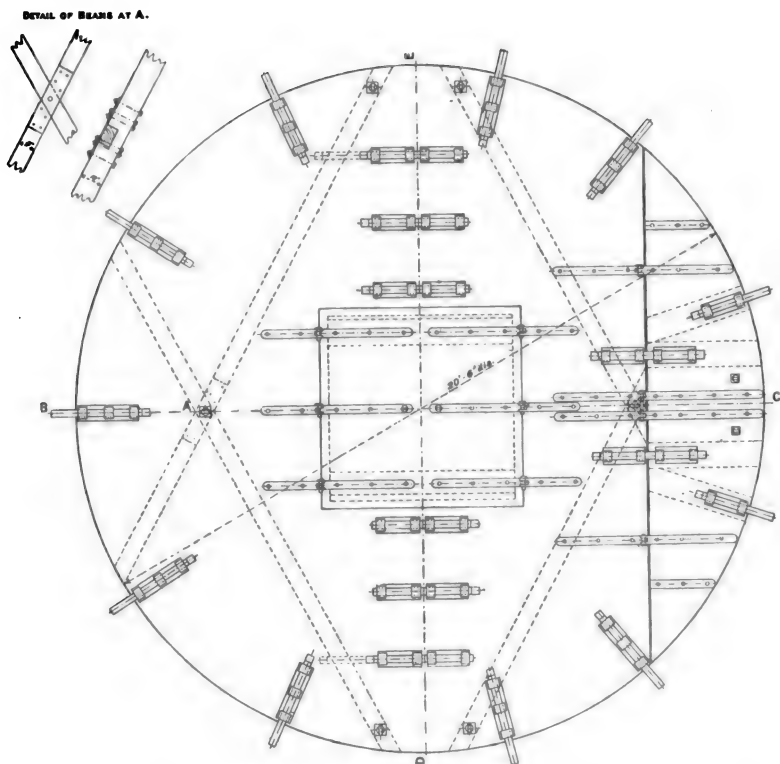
Plan of Walling Stage or Cradle, constructed of Wood, for a Pit 21 feet in diameter. (Messrs. J. Cook, Sons & Co., Ltd.)
